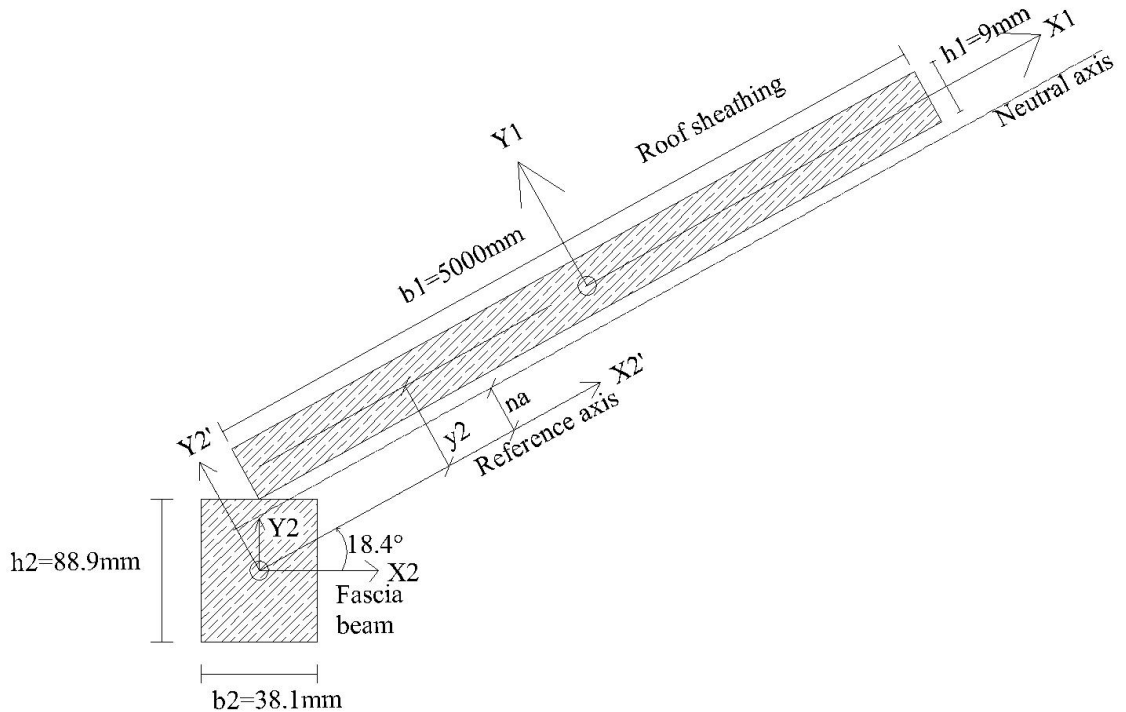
Cross section of 5000mm long, 9mm thick roof sheathing and 2x4 fascia beam.
